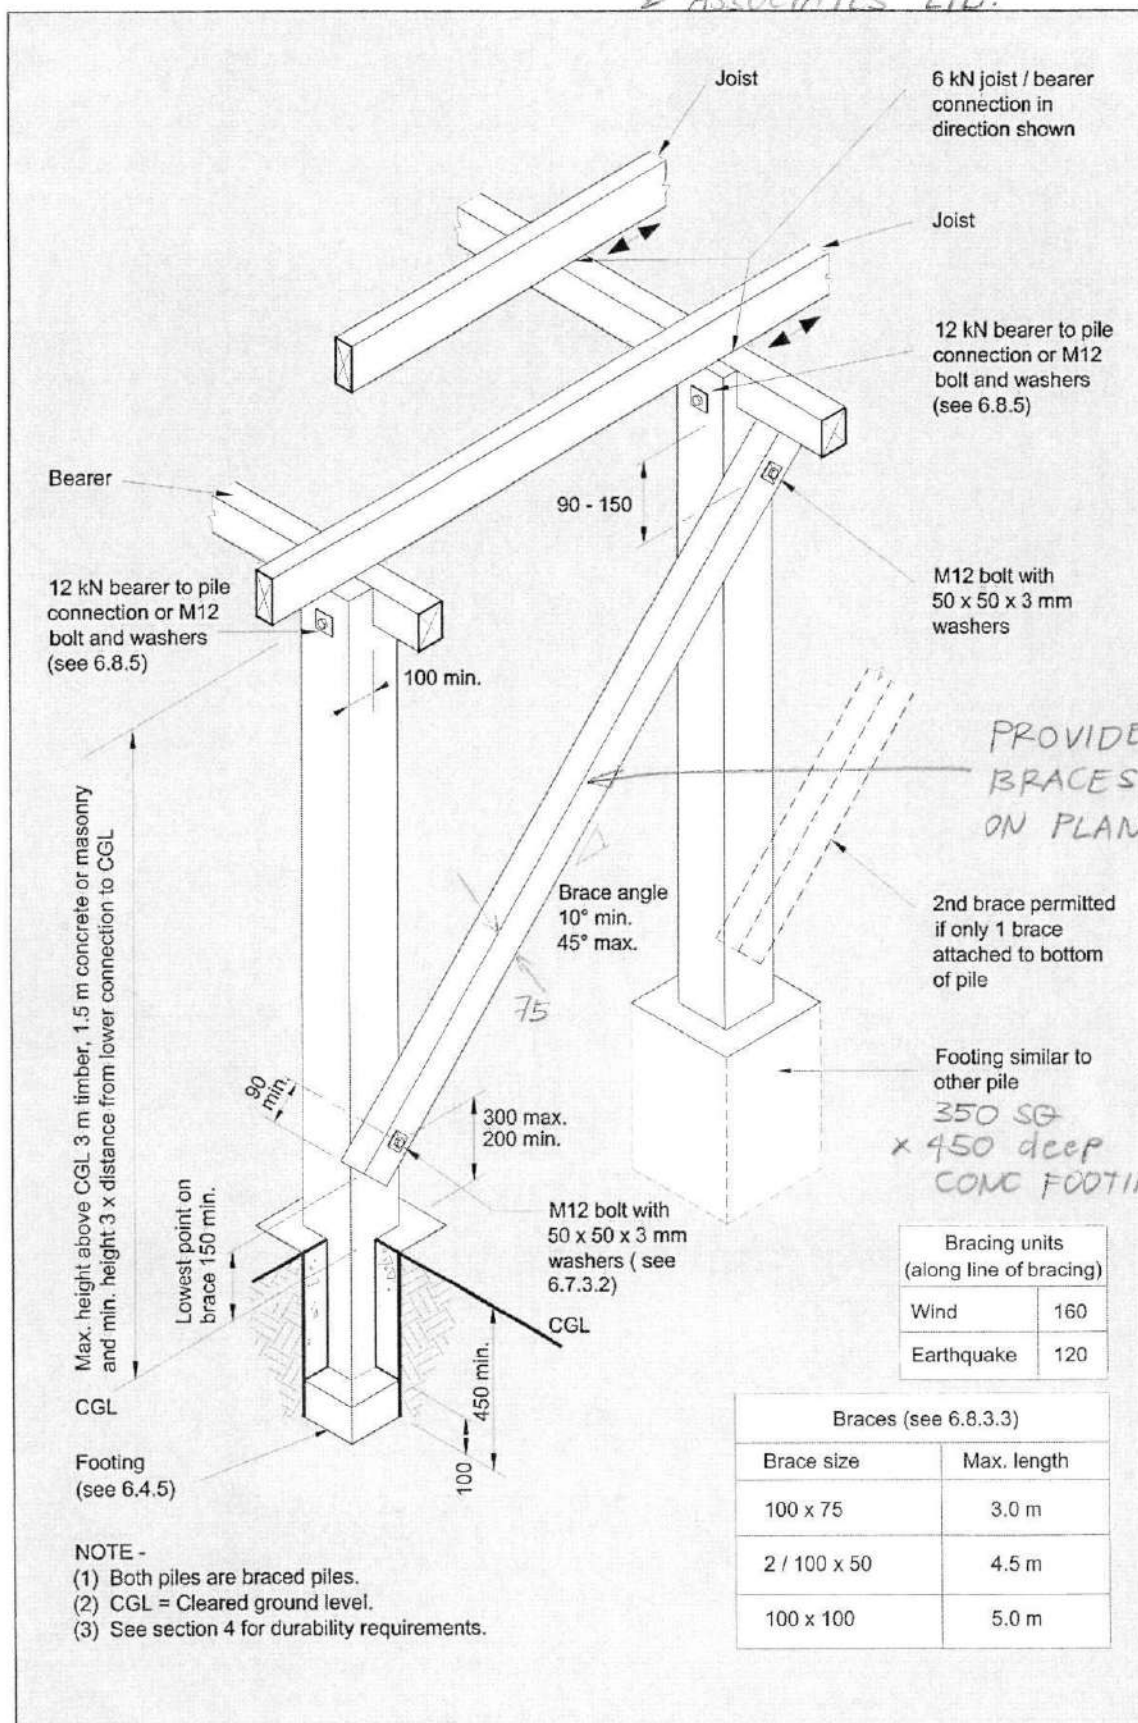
Braced pile system – Brace connected to pile (see 6.8)
